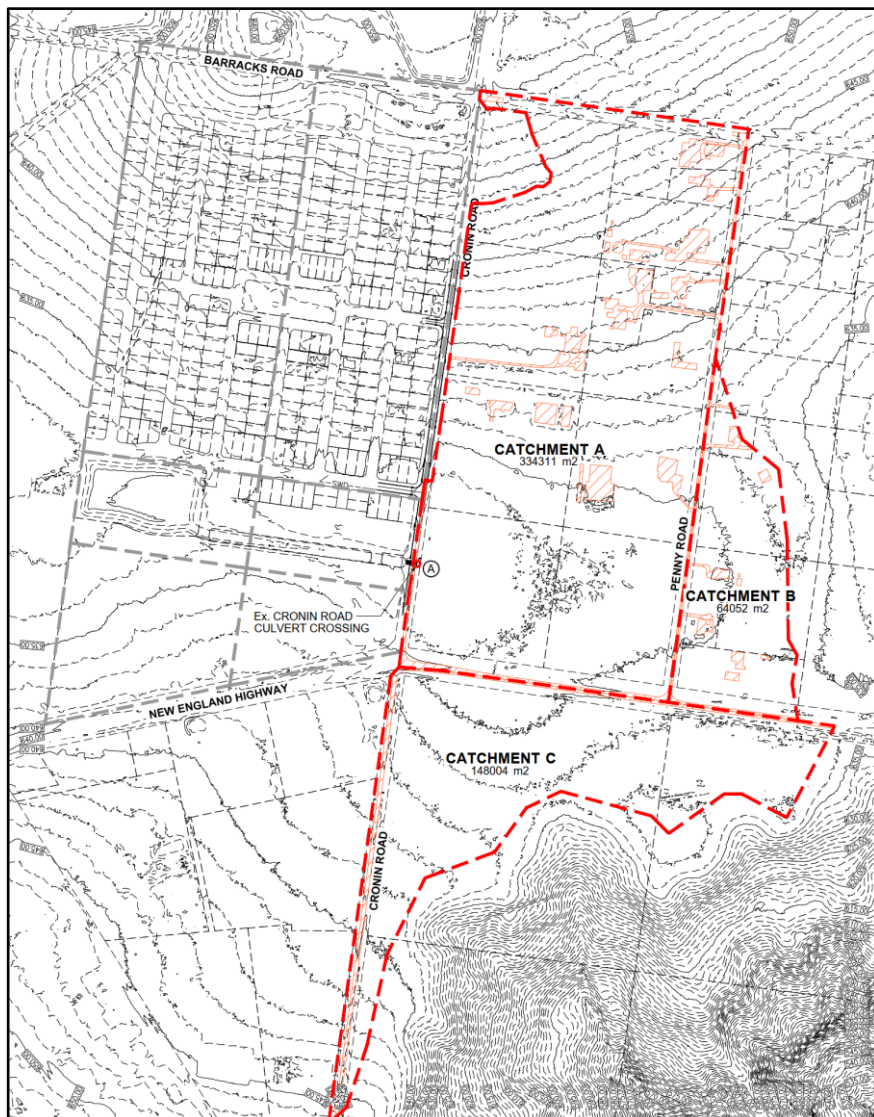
PRE-DEVELOPED STORMWATER CATCHMENT PLAN
